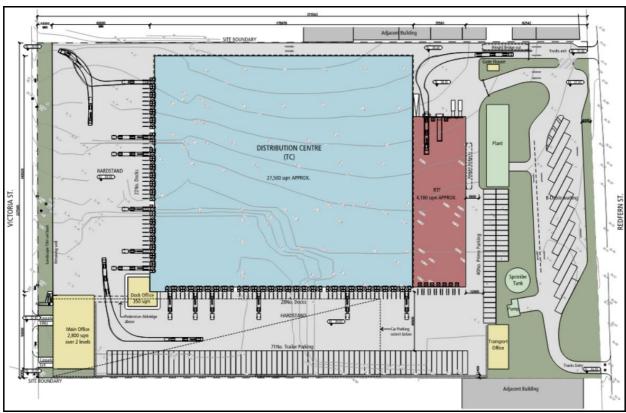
Initial Concept Layout (Source: Watson Young, 2021)
